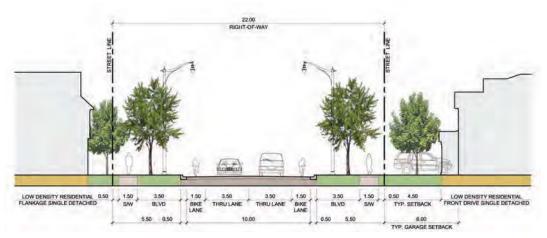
Conceptual typical treatment for Collector Roads A, B, C, D, E, F (south) and G (22.0m ROW) with 2 thru lanes, on-street bike lanes, no on-street parking and street trees in grass boulevard.
